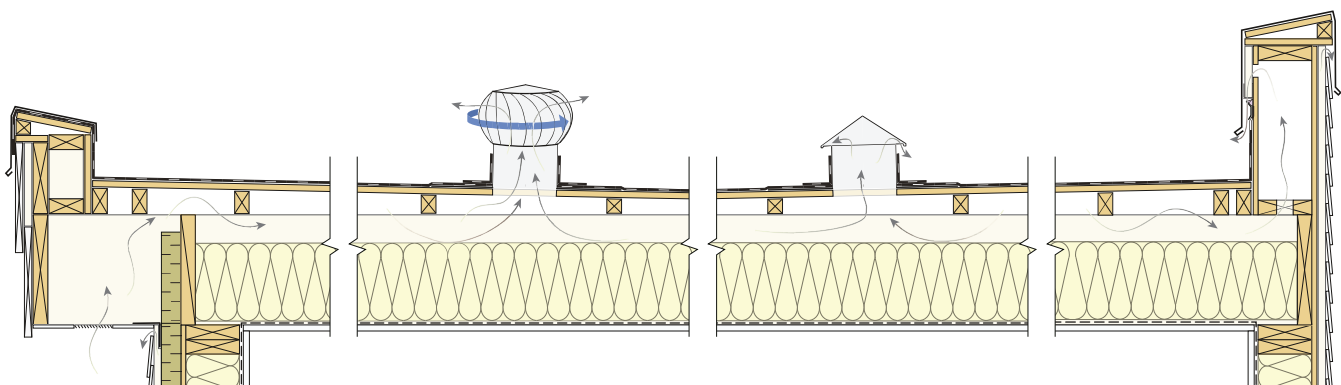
Example of Venting Options from left to right: Soffit Vent, Turbine Roof Vent, Doghouse Roof Vent, Parapet Vent
